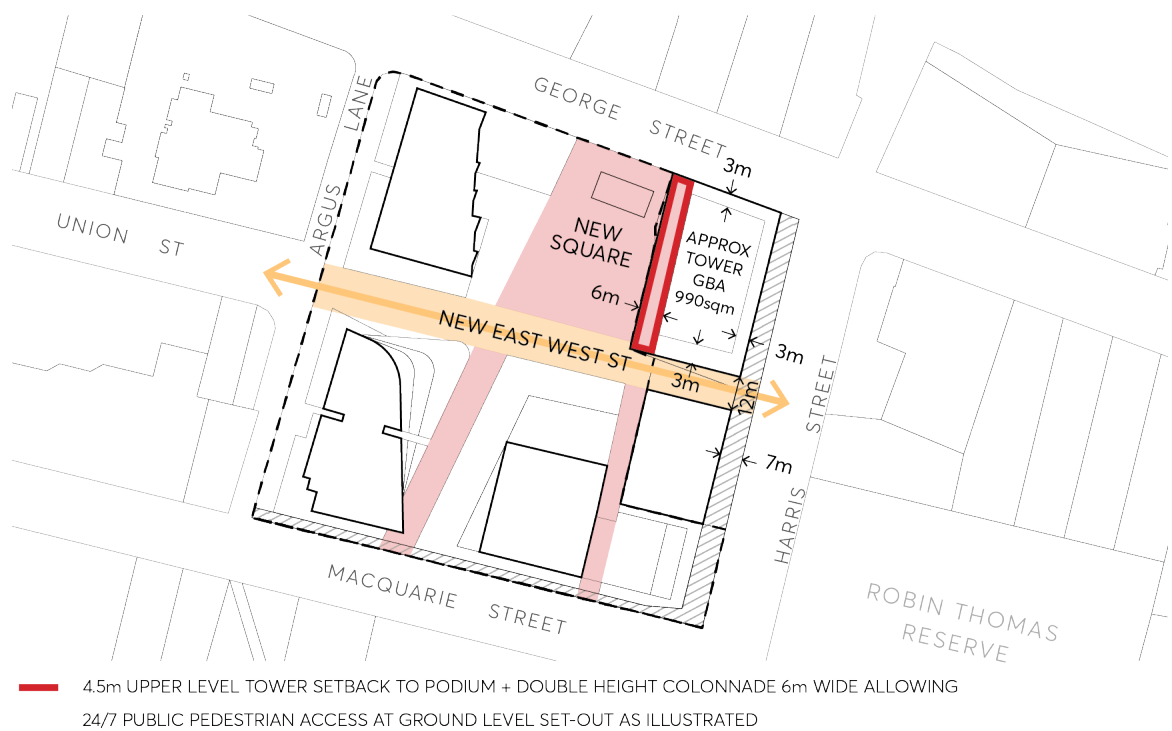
Height of buildings in storeys and setbacks to towers over podium on former Albion Hotel Site
